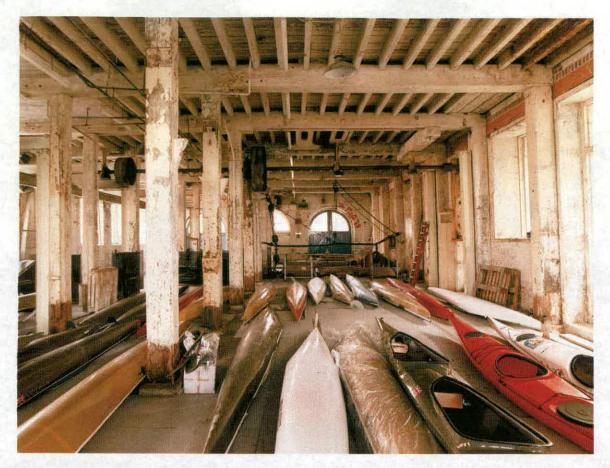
the ground-floor interior of the north range, viewed from the west (English Heritage, AA042428).
